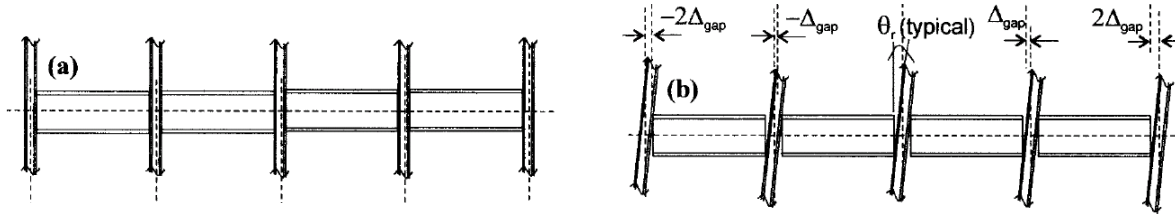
Elevation of one floor of a SC-MRF: (a) undeformed, (b) deformed configurations.
